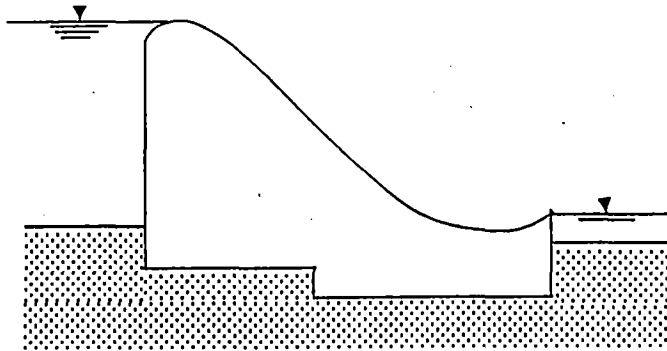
Case II. Depressed Stepped Floor without Pile
